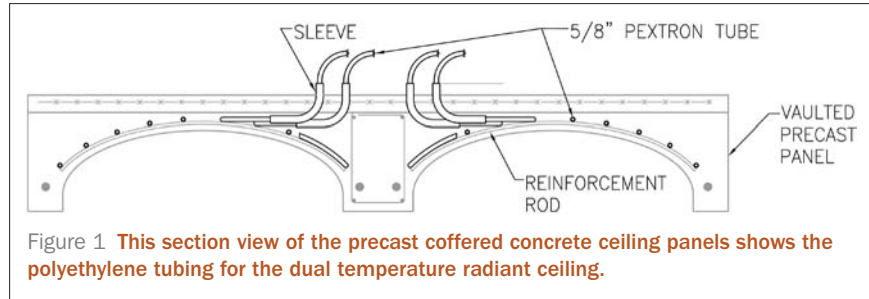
This section view of the precast coffered concrete ceiling panels shows the polyethylene tubing for the dual temperature radiant ceiling.
